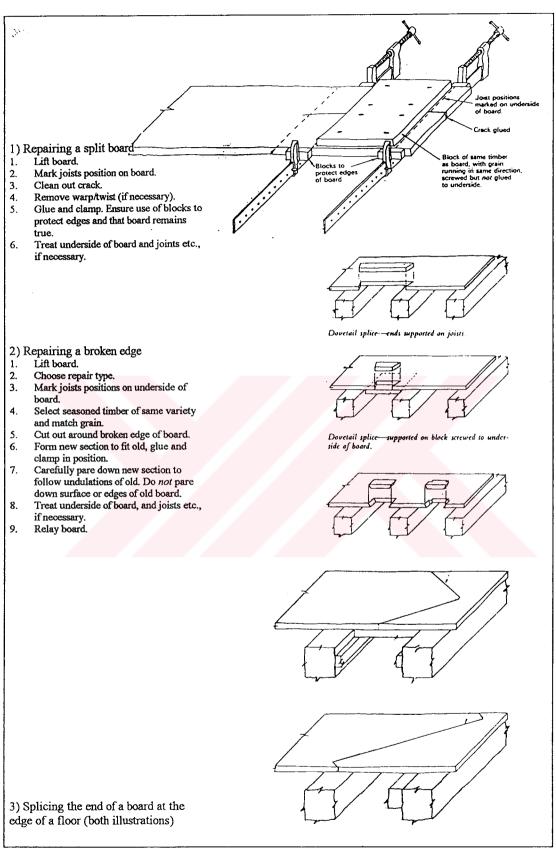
Repairing a Split Board, Partial Renewal, Reinforcement of Weakened Floor Boards (Hughes, P., 1988).
